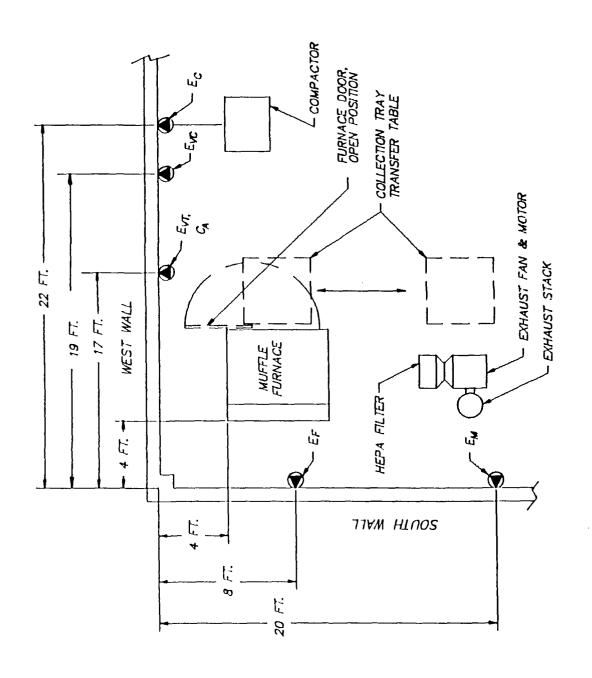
Another possible location for the radwaste processing system equipment. E_M , E_F , E_{VT} , E_C and E_{VC} refer to electrical outlets for the fan motor, furnace, vacuum transfer, compactor and vial crusher respectively; C_A refers to the compressed air outlet.
